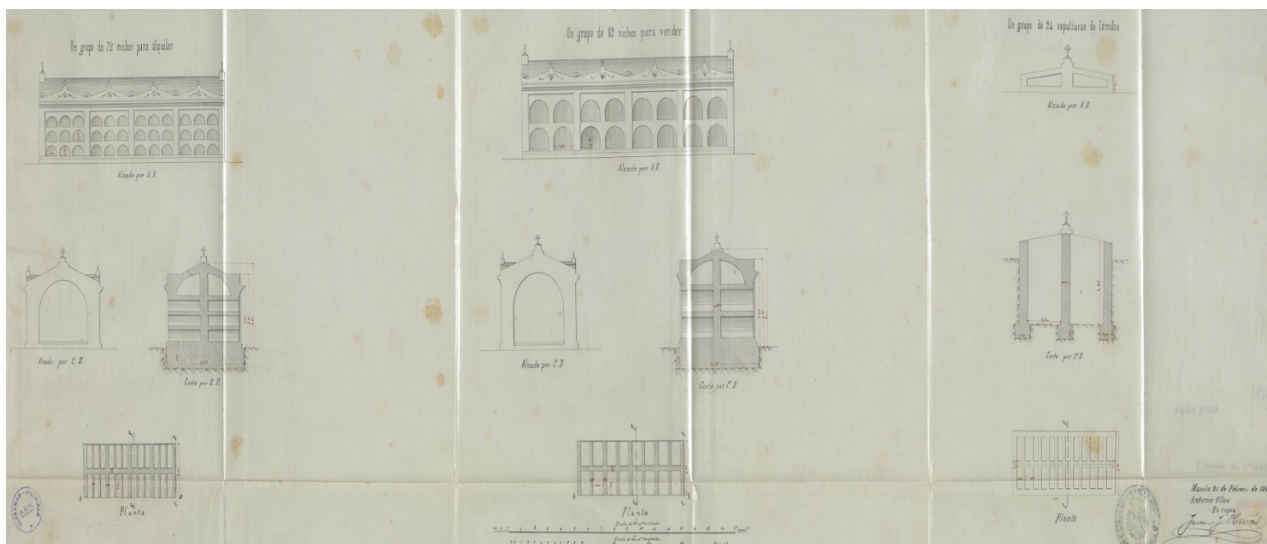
Plan for the construction of a new cemetery for Manila and its arrabales. Plan for the niches and sepulchres of families, 1882.
